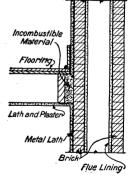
No woodwork should be permitted closer than 2 inches to the outside face of a chimney. Baseboards in front of chimneys should be protected with asbestos board
